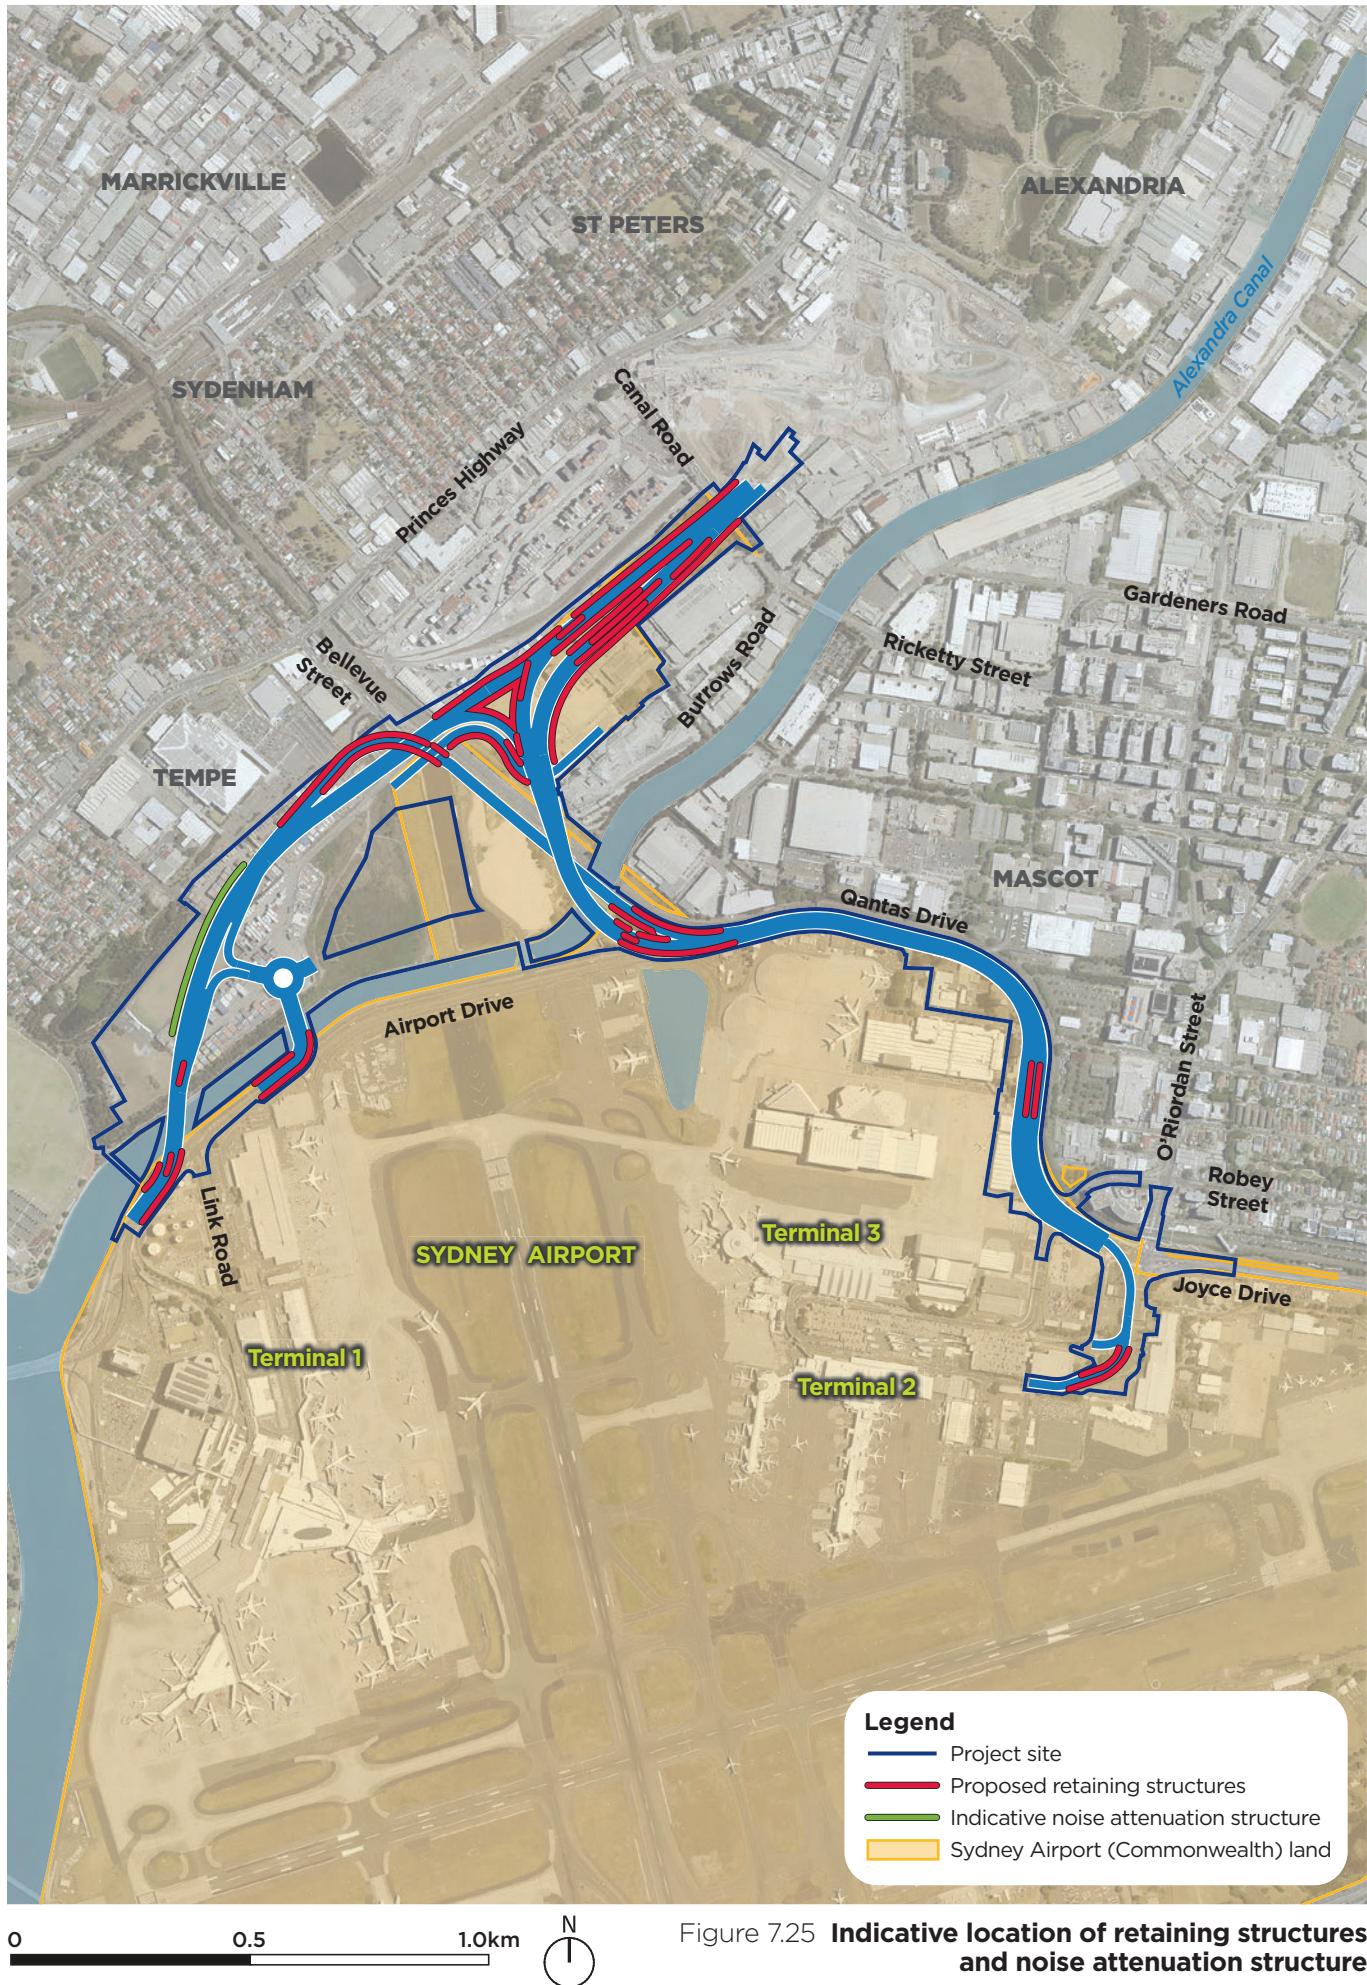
Indicative location of retaining structures and noise attenuation structure
